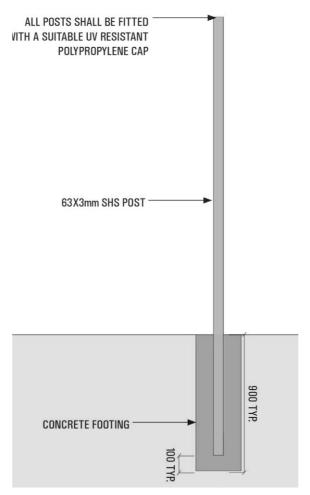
Type 2: Palisade Fencing to Station Precincts section Scale 1:25 @A3
